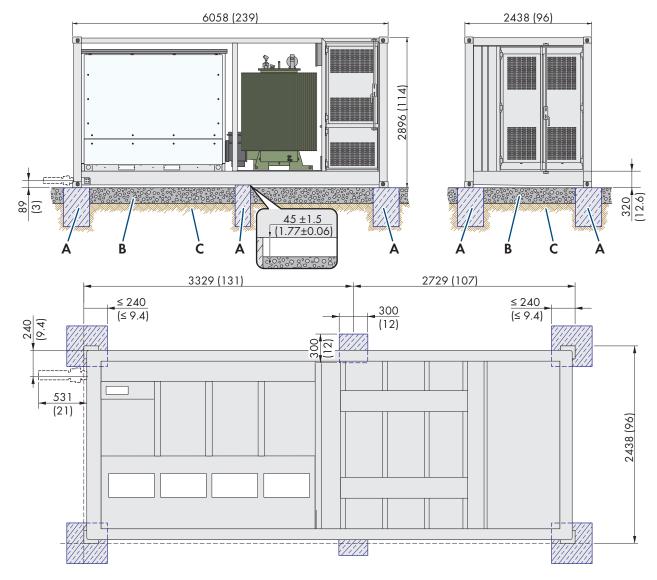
Mounting option with pile foundation (Dimensions in mm (in))
